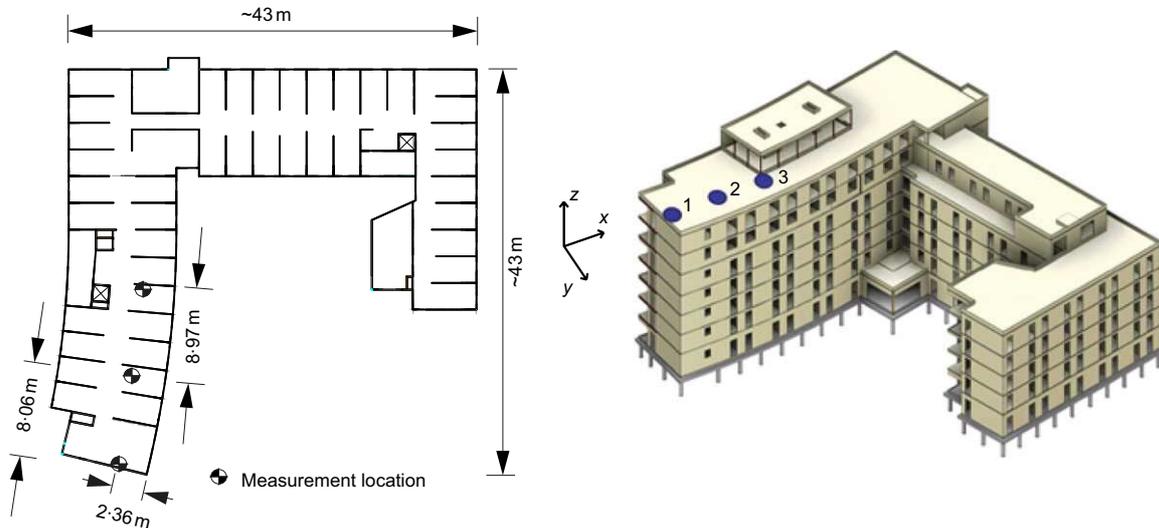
Schematic diagram of the building structure, with accelerometer positions indicated by the numbered locations, and measurement directions x and y ; concrete piles are shown on the isometric view
